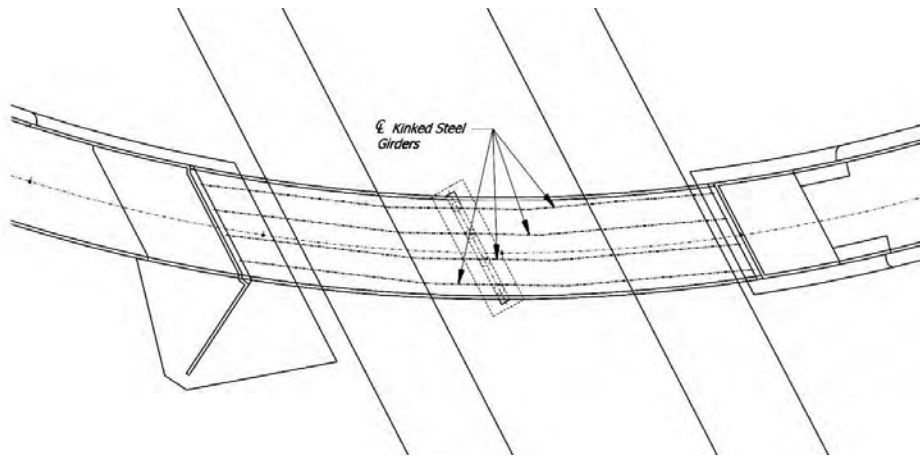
Plan view of a curved bridge with kinked girders (Example 2)
